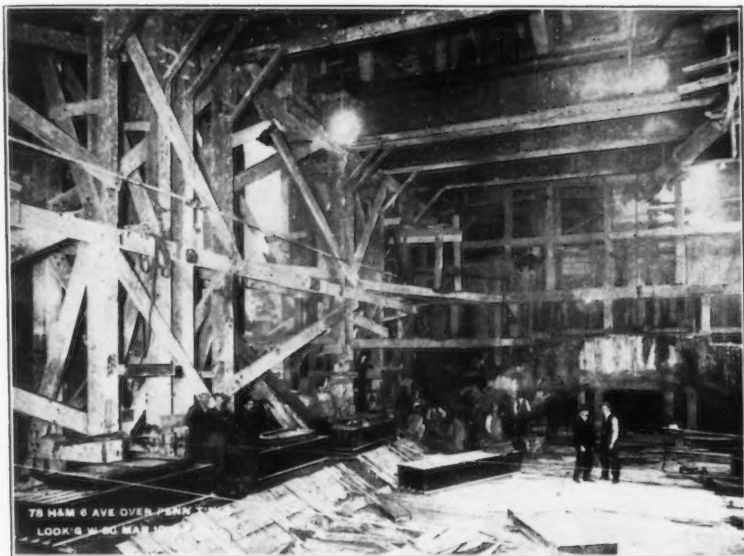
PLACING STEEL GRILLAGES FOR SUPPORT OF GIRDERS OVER ARCH OF PENNSYLVANIA RAILROAD TUNNEL.
